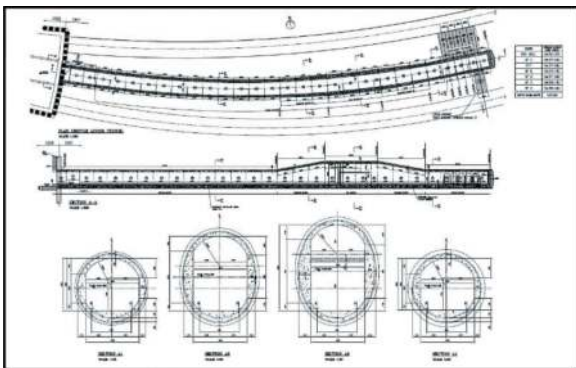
Plan, Profile and Sections of Cripple siding tunnel.
